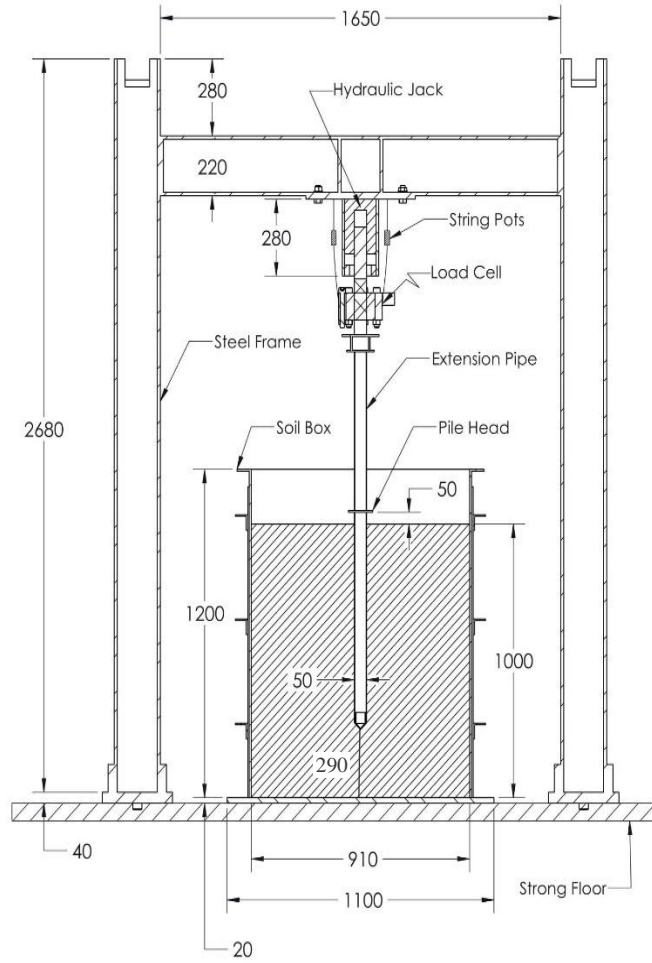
Detailed drawing showing pile load test setup after pile has been jacked-driven to the desired depth
